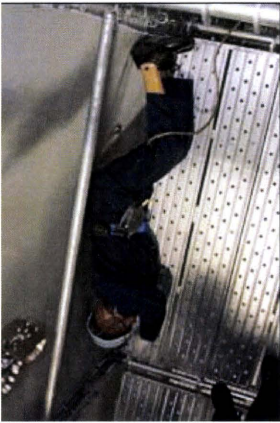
shows the typical pipe scaffolds and prefabricated scaffolds used in Japan. In the case of pipe scaffolds, the workers sometimes fell from the space between the handrail and the work platform, and they also fell from the space between the braces and the work platform in the case of the prefabricated scaffolds, as shown in Photo 2.
